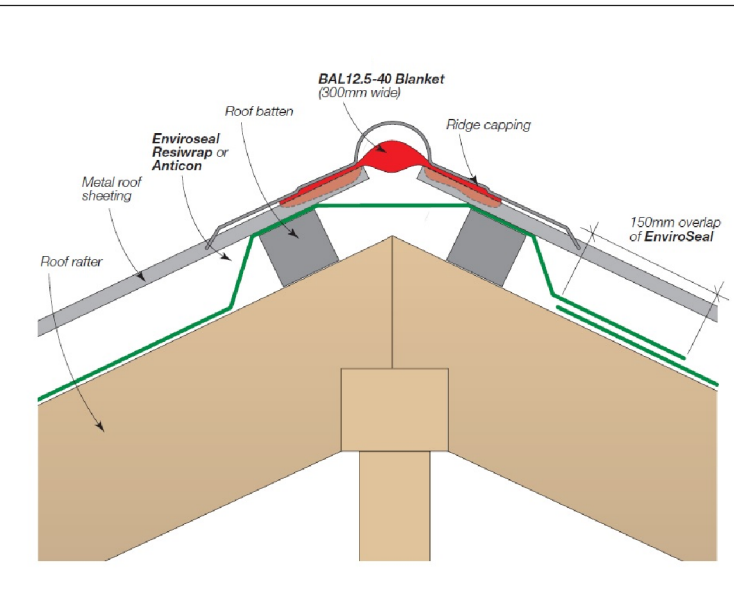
Hip/Ridge Detail – Steel Roof (BAL-12.5 – BAL-40)
